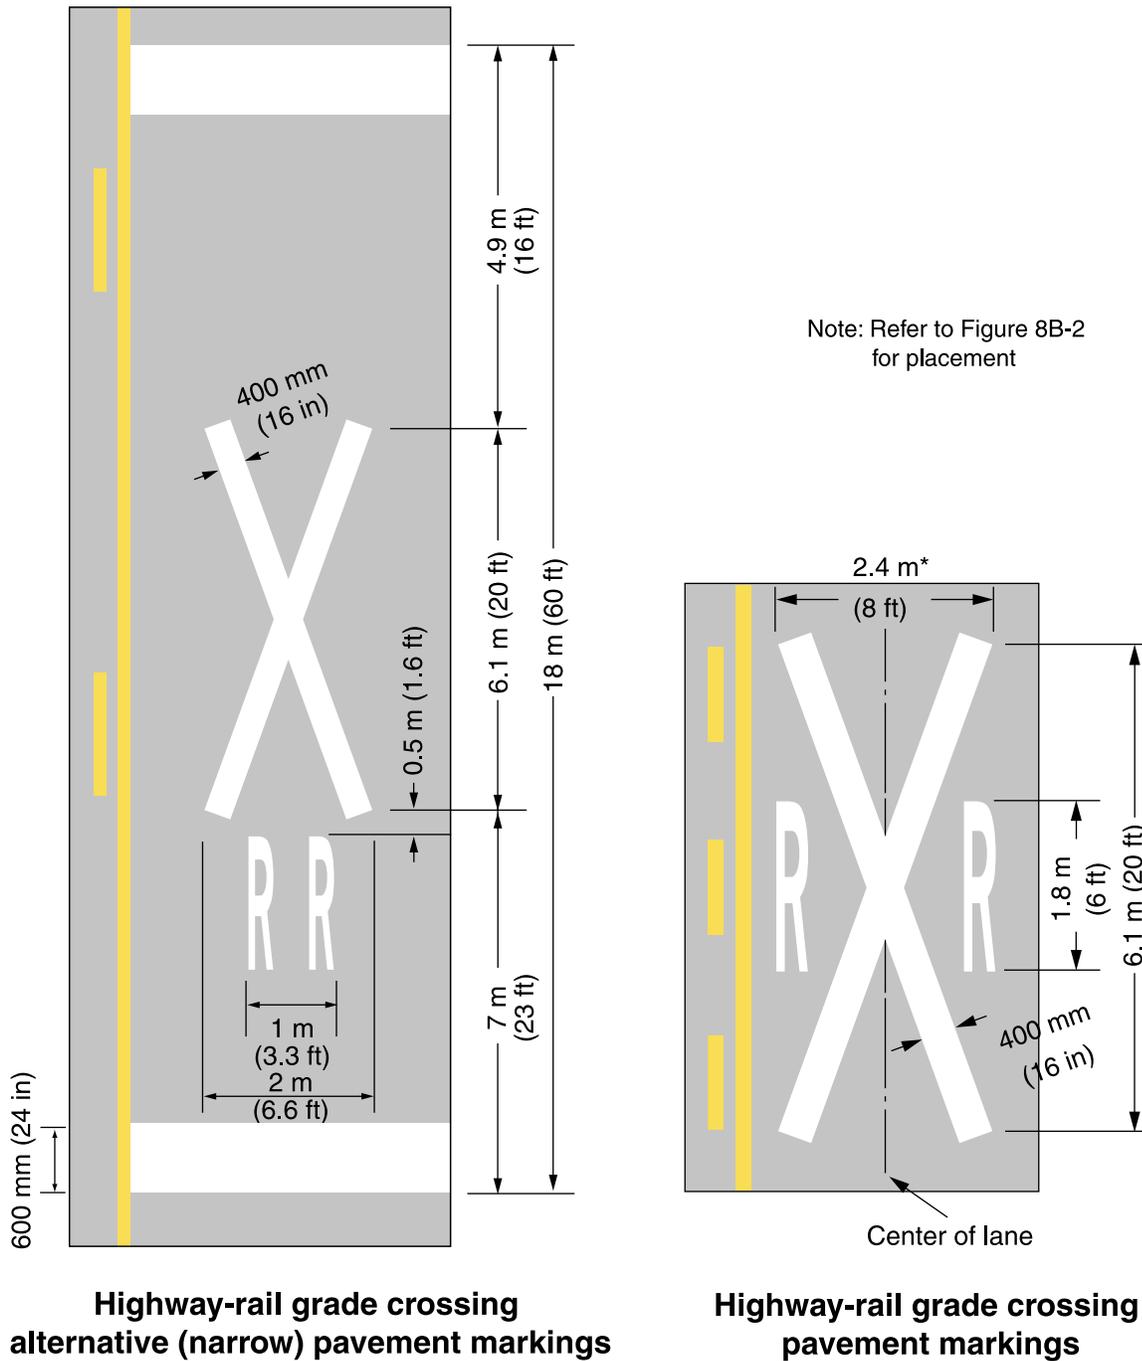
B-3. Typical Highway-Rail Grade Crossing Pavement Markings
